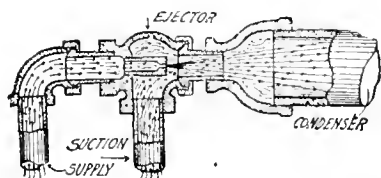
STEAM EJECTOR USED IN THE MOLINE VACUUM VAPOR HEATING SYSTEM
